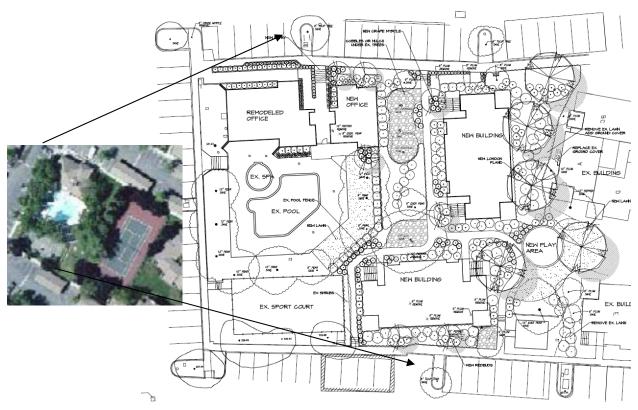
Building's One and Two Facing the Remodeled Recreation Area
